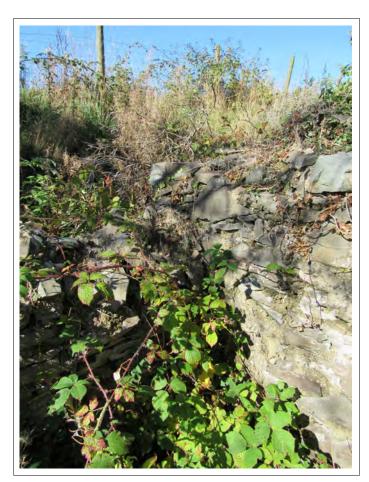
Join of southern wall of house ruins and western boundary wall, detail. View NW.
